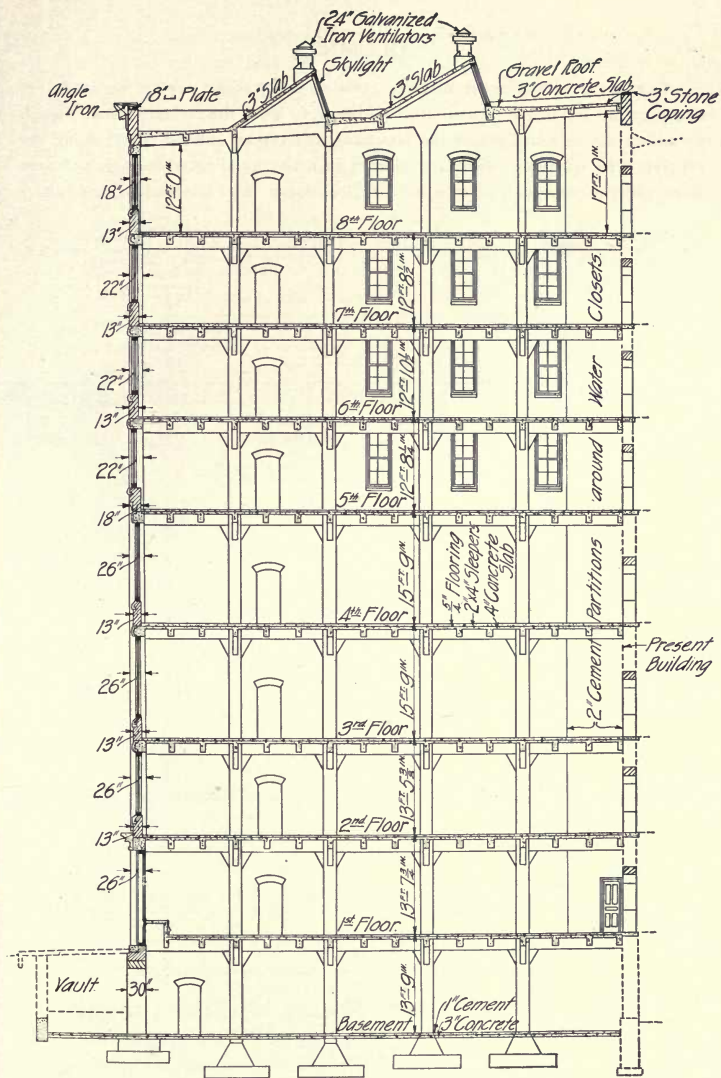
Cross-Section of Ketterlinus Building. (See p. 62.)
